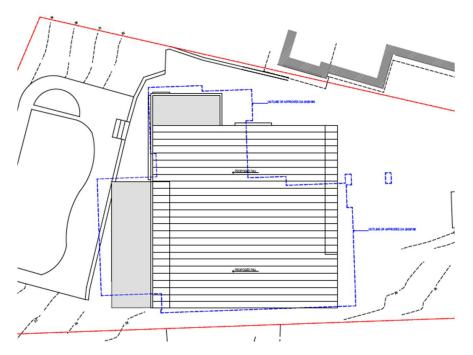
Overlay of DA 2020/189 approved and proposed to be altered dwelling roof plan
